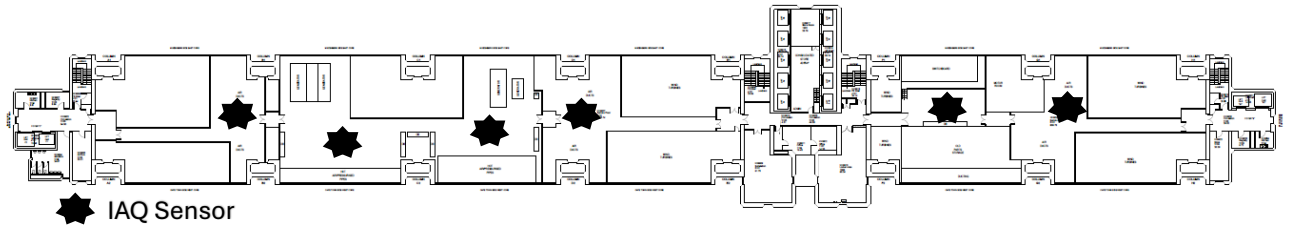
Tower Building proposed sensor positioning 11th floor (6)
